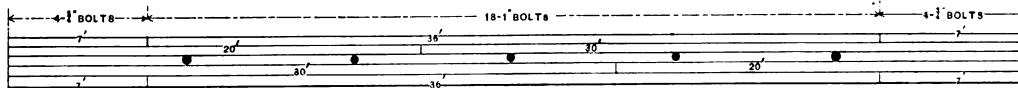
Plan of Tie Beam Made of Five 2 x 10 Inch Plank.
